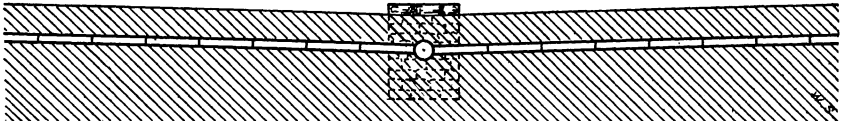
Longitudinal section at "xy," on fig. 7, showing discharge of subdrain into culvert pipe.
